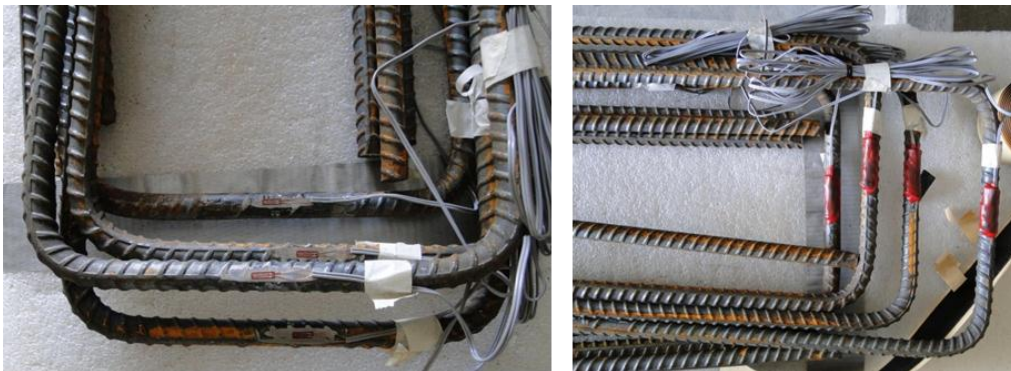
Strain gauges on the slab beam shear reinforcement
